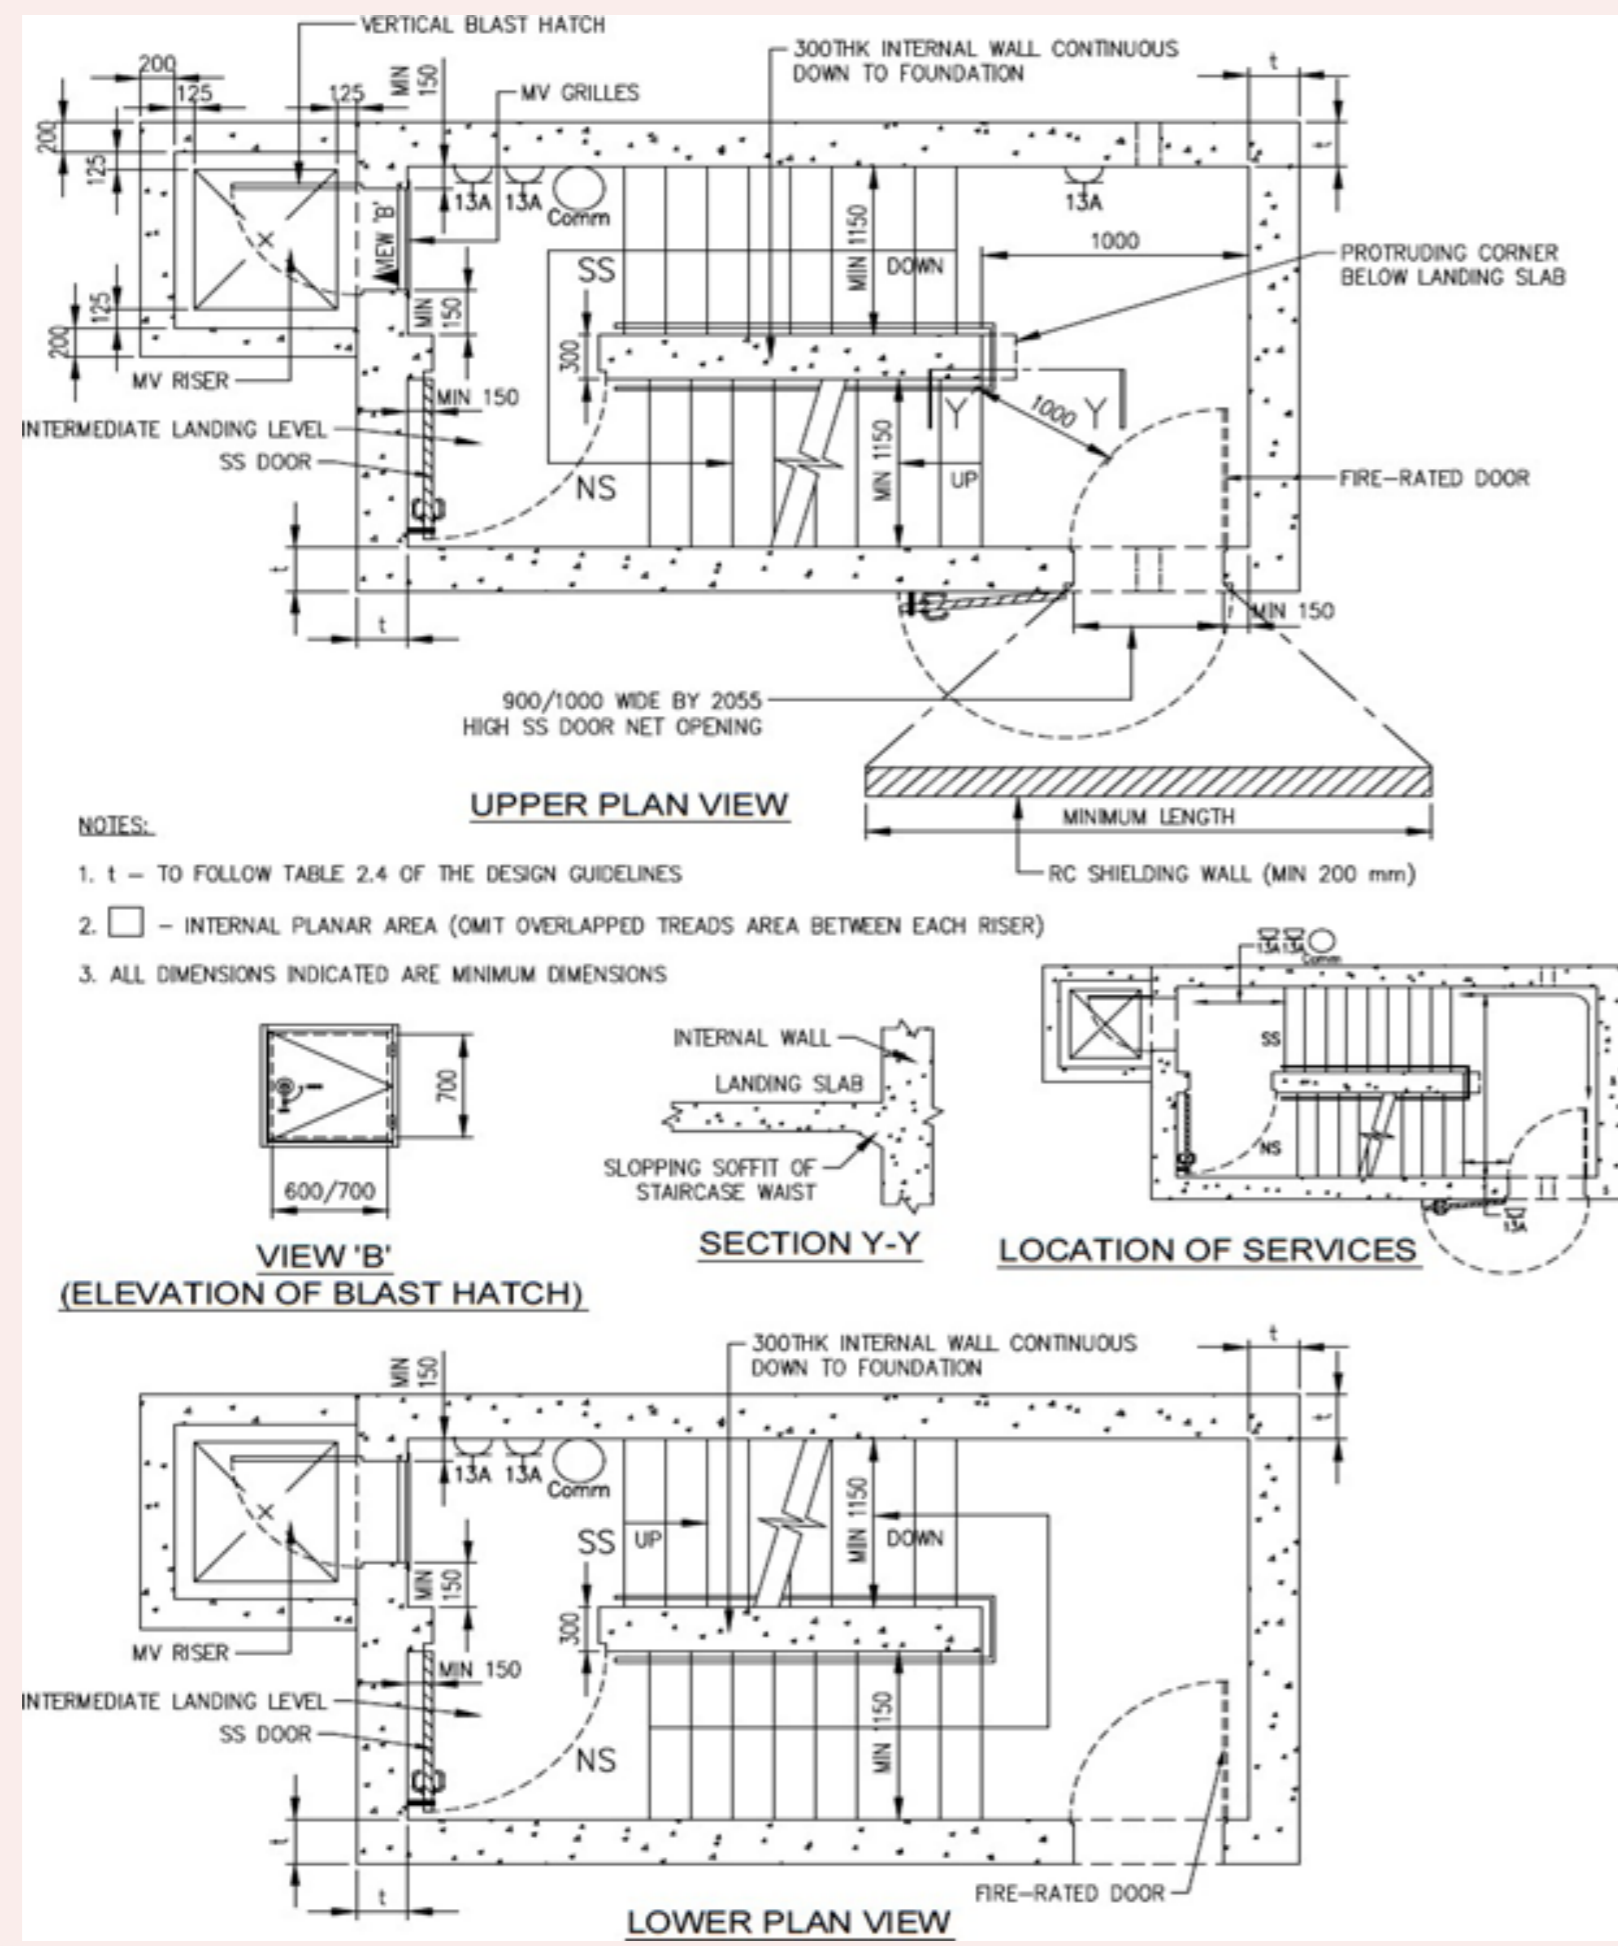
INTERNAL COMMON WALL BETWEEN TWO SS
